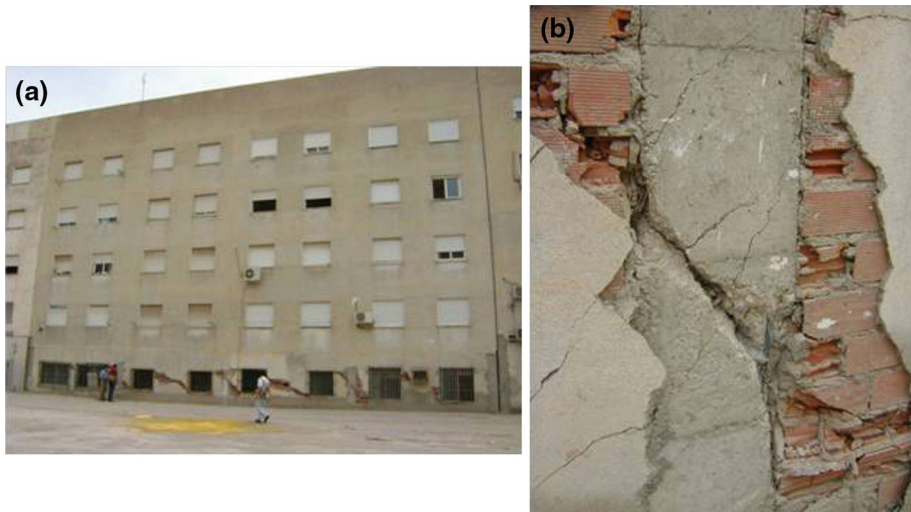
Example of cracks crossing a column at mid-floor height. a Building, b detail
